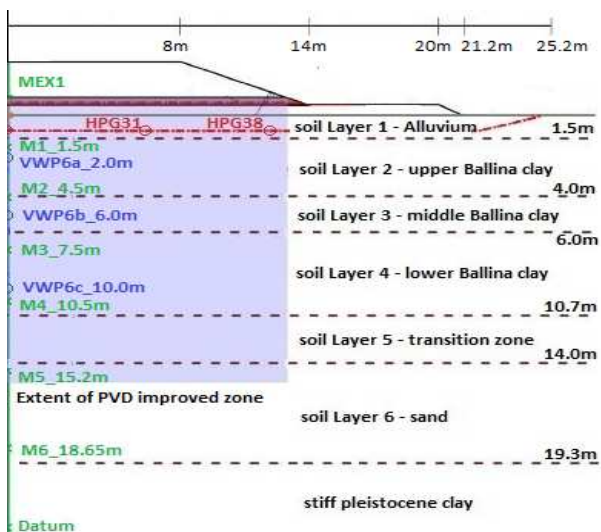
Cross section of Ballina test embankment. Soil layering and location of instrumentation adapted from Kelly *et al.* (2018).
